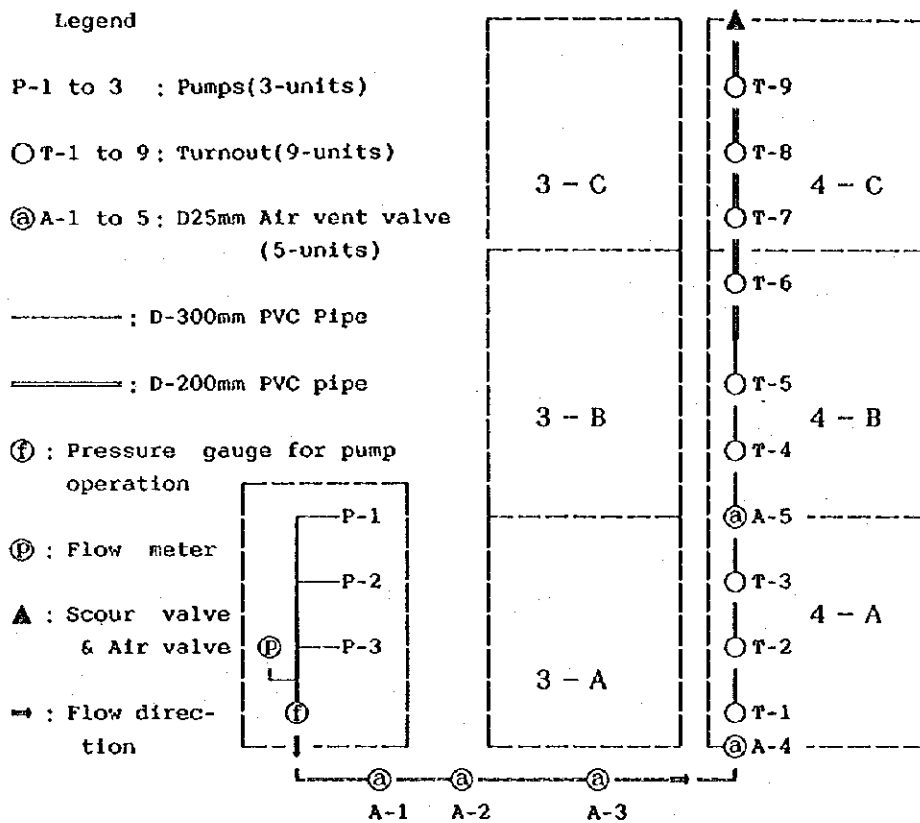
Schematic plan of traveling sprinkler irrigation system
